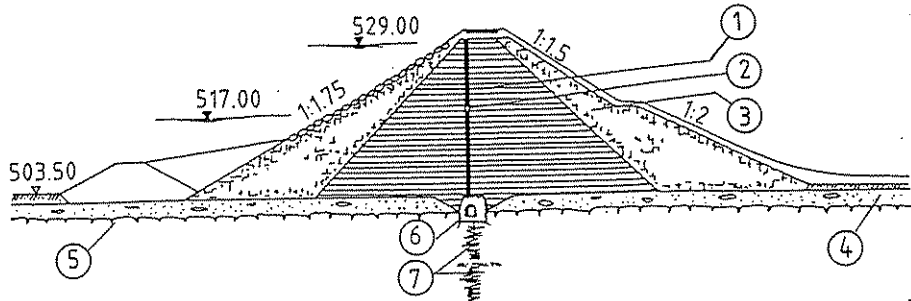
Typical section of Förmitz earth and rockfill dam with earth core and trench diaphragm (adapted from List 1980).
